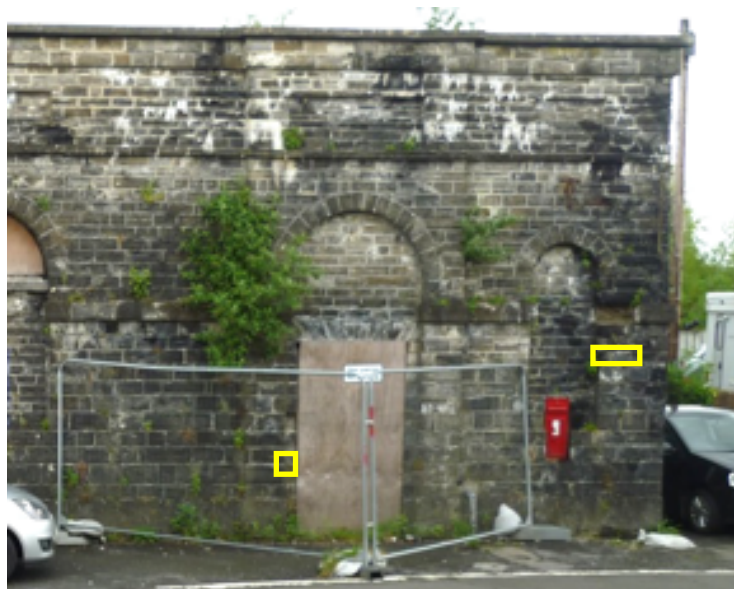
above: Missing stones highlighted in yellow and boarded up door to be replaced on southern end of market south west elevation
